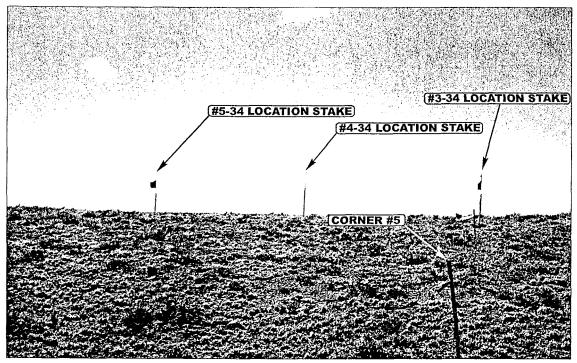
PHOTO: VIEW FROM PIT CORNER "D" TO LOCATION STAKE
